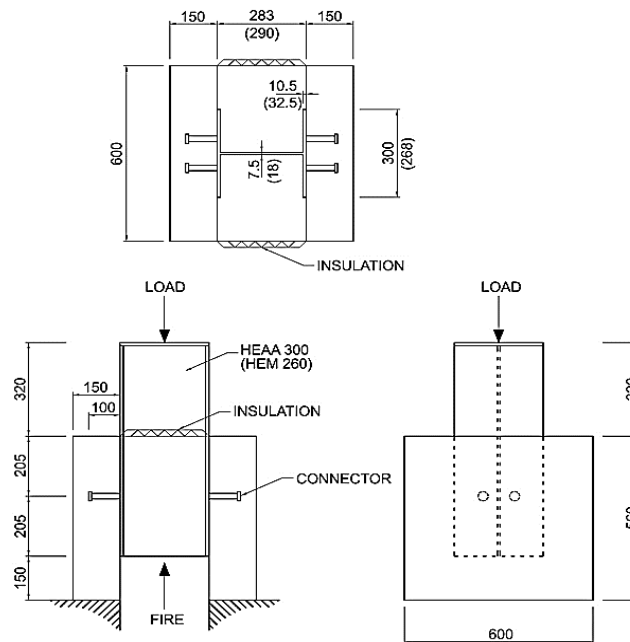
Details of push out test setup by Quevedo and Silva (2013)
